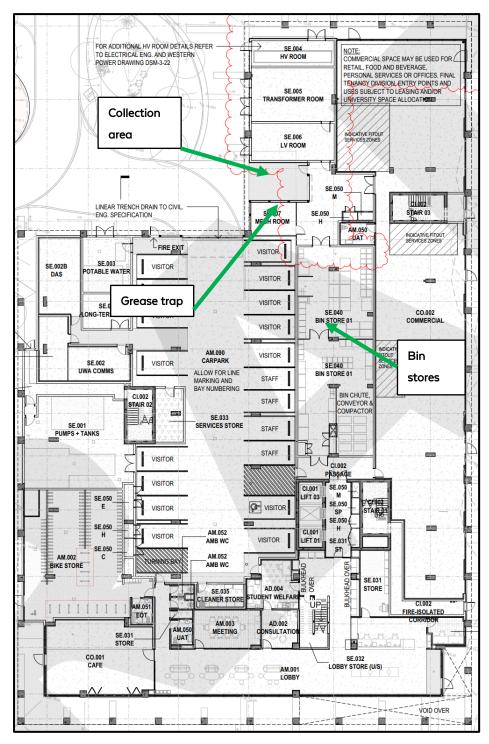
Ground floor plan showing the location of bin stores, chutes and collection area Page 9
